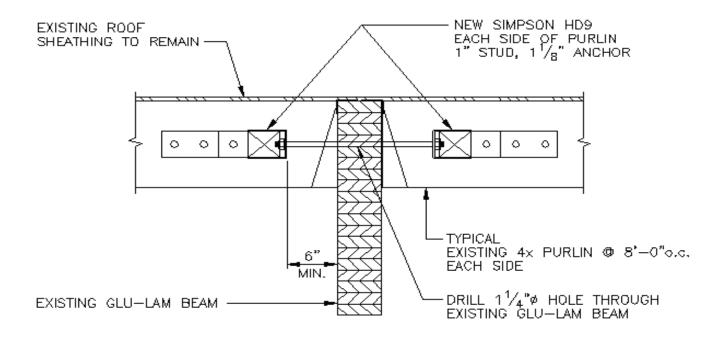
TYPICAL CROSS TIE PURLIN TO GLULAM BEAM CONNECTION DETAIL
